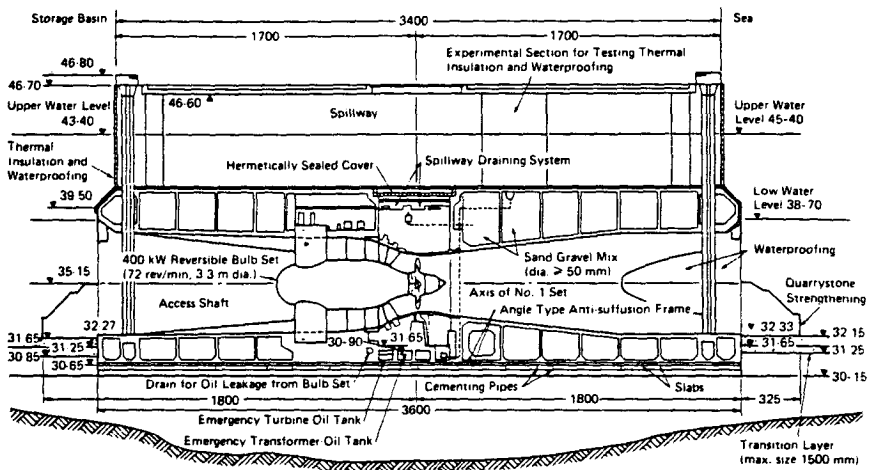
Sectional elevation of Kislaya Guba power house caisson
